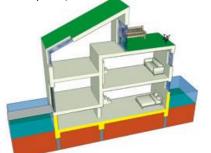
Dry proof construction of houses; keep the water outside the house. Source: Asselman & Slager, 2013
